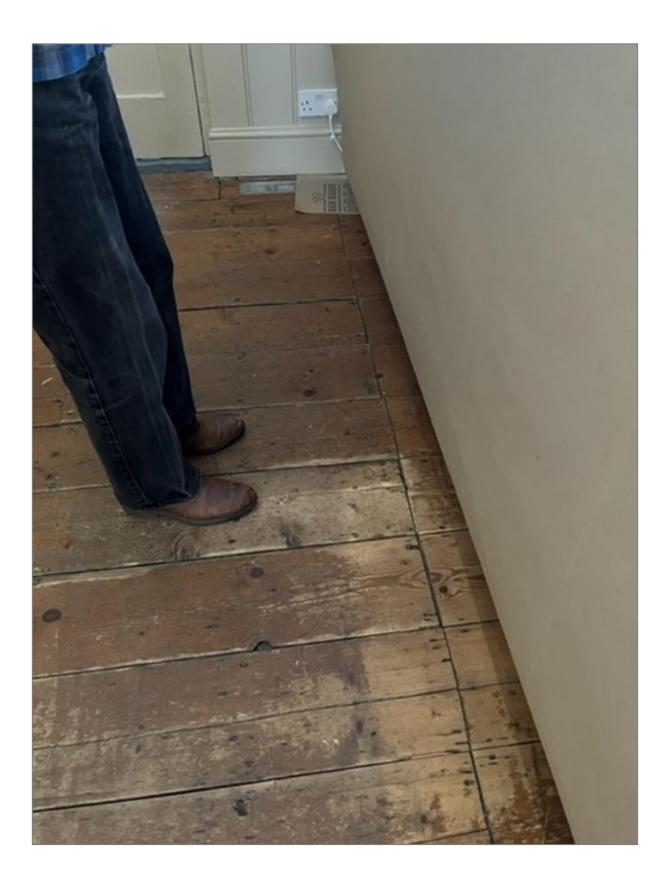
Party fence wall with 37 Gloucester Crescent.
